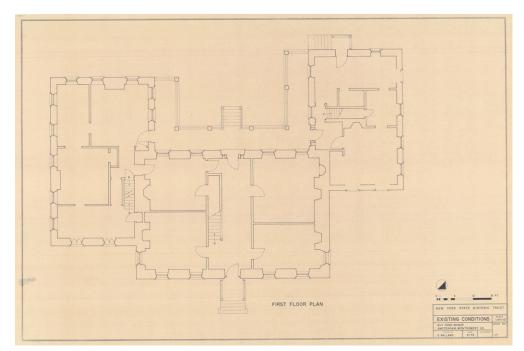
First floor plan of the house (S. Ballard, February 1973).
